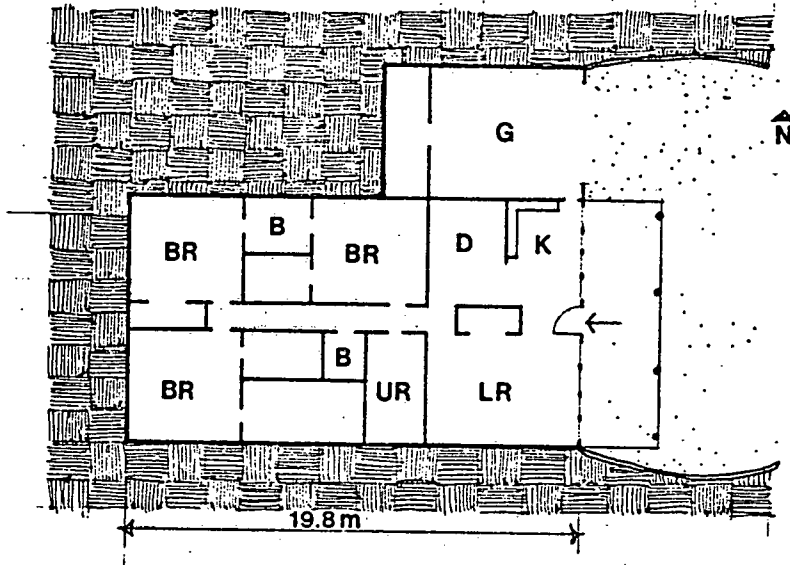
Site B is a large concrete block structure with no external insulation except at the east facing exposure.
